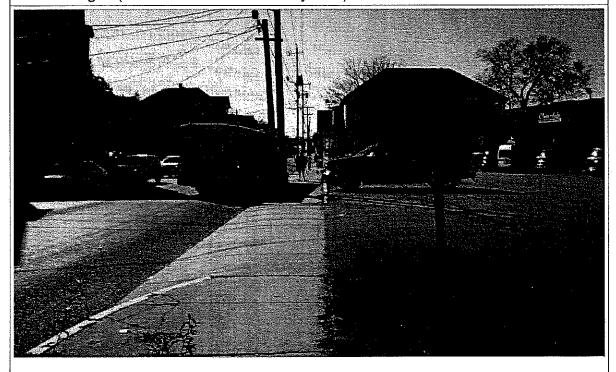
Opposite view facing southwest. Subject property on right, North Main Street on left. (Photo taken 9-Nov-2021 by SPR)
